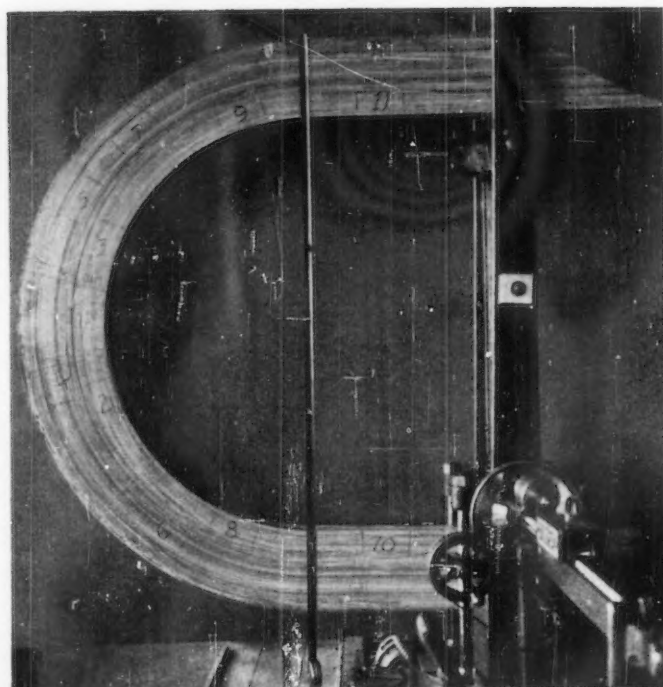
Radial-Tension Specimen in Position in Machine After Test. Test is made by pulling ends of specimen apart. Note circumferential cracks where tension failure has occurred.
